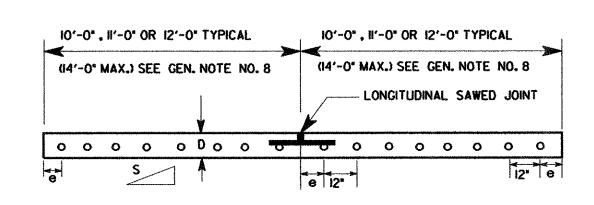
DETAIL D LONGITUDINAL SAWED OR FORMED JOINTS
